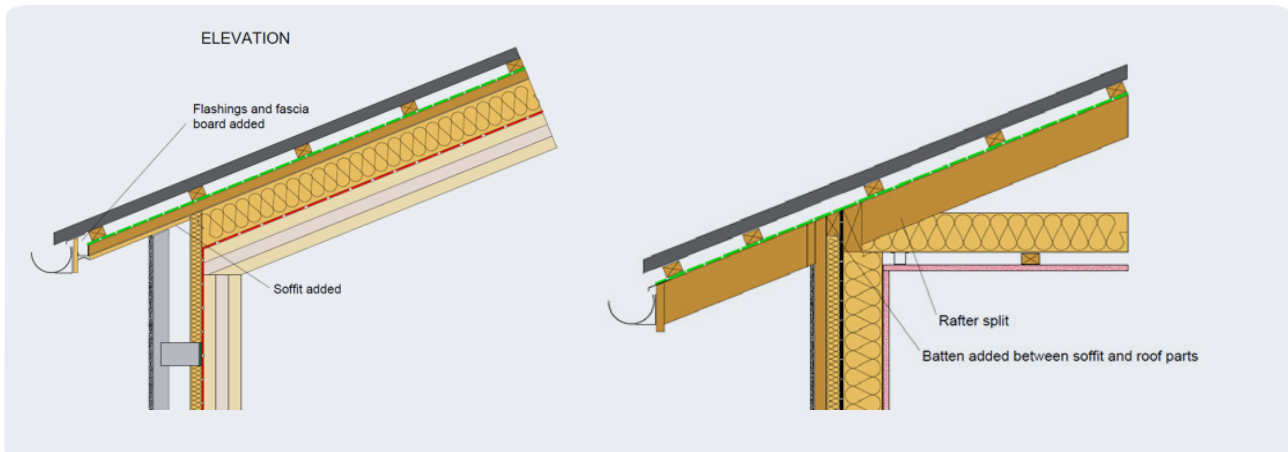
Junction between a mass timber exterior wall and inclined roof
